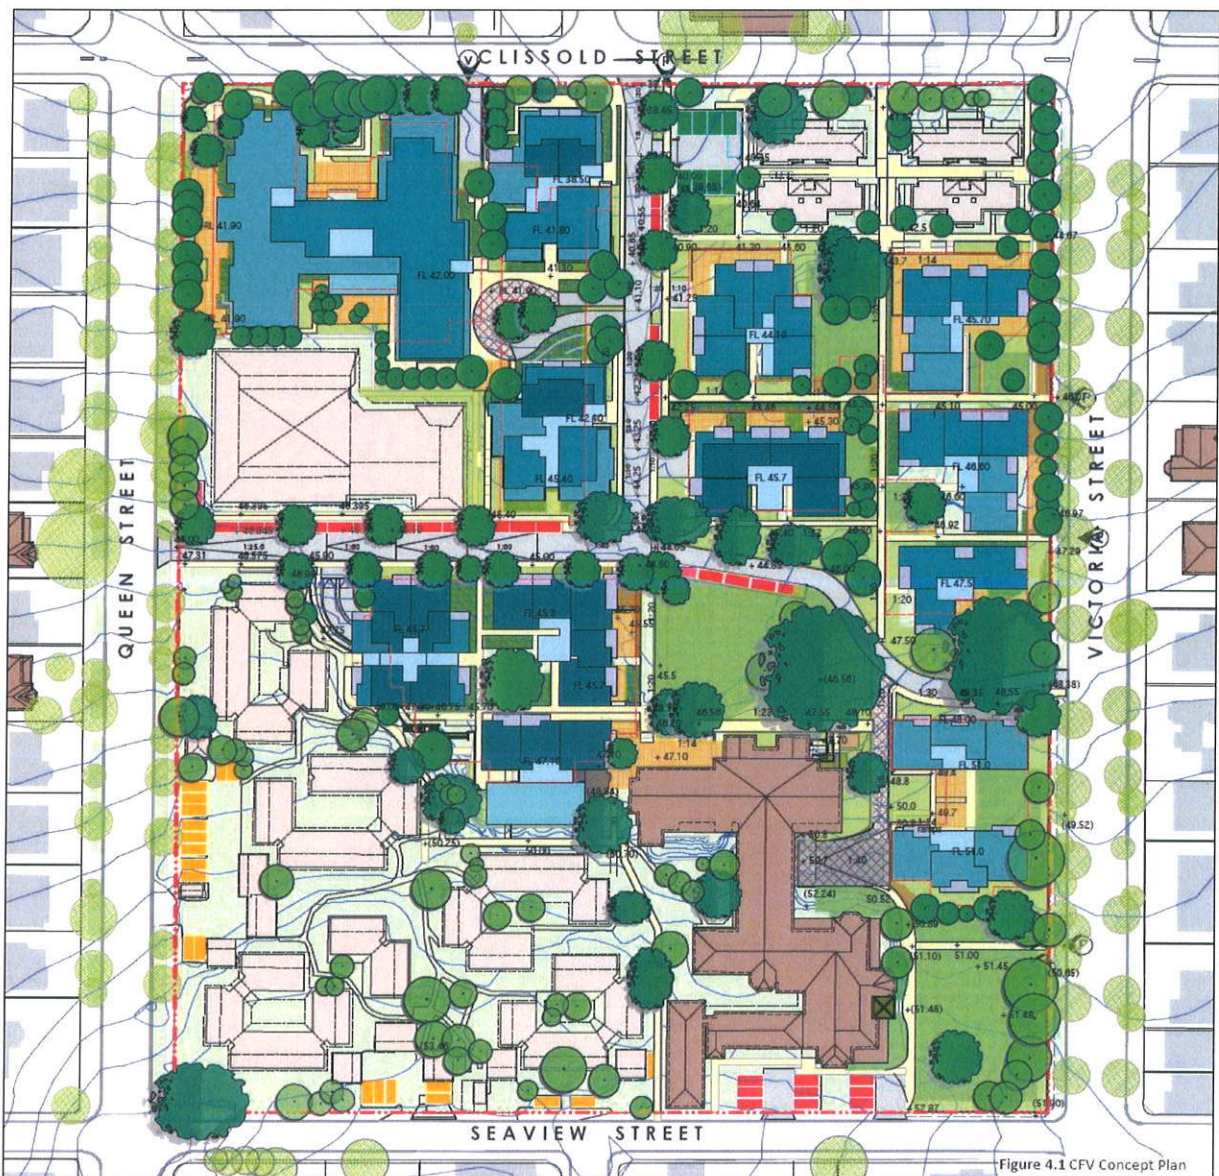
Approved Concept Plan layout (Source: proponent's Environmental Assessment)
